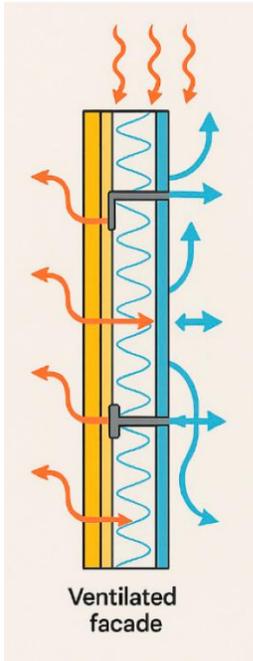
Cold Facade. Source: <https://www.mdpi.com/2227-9717/13/7/2275>
